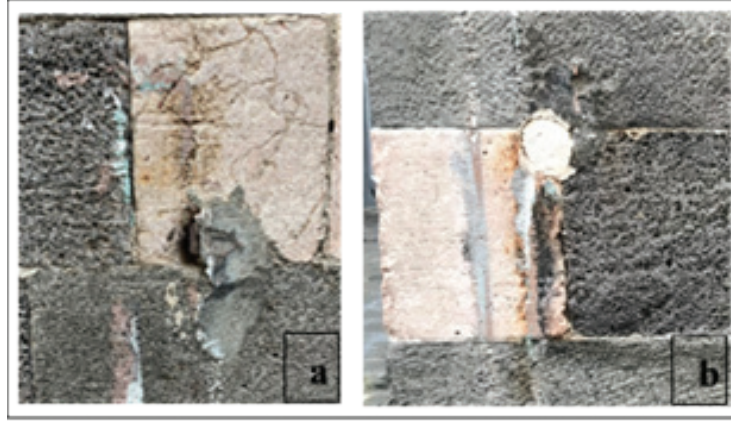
Corrosion and Rust Stain a. East Façade Wall b. West Façade Wall
